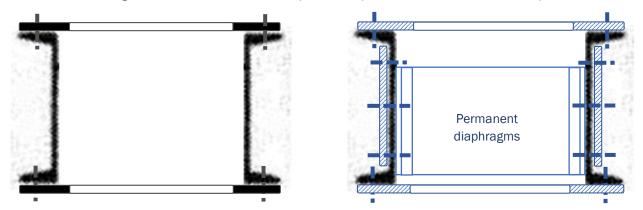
Current (left) and reinforced (right) sections of 14-16 members
